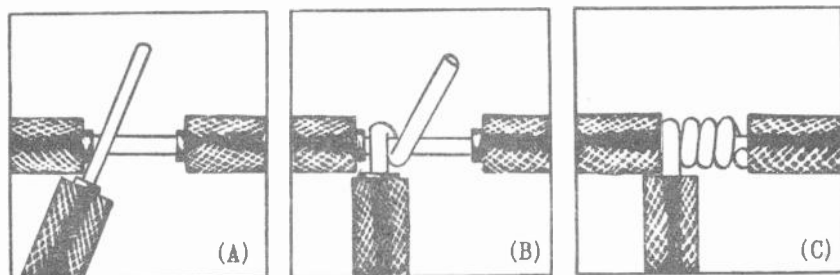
(A) Joining the end of a wire to a continuous wire. This figure shows the preparation of the two wires. (B) Shows the start of the twist. (C) Showing the finished joint before soldering.
